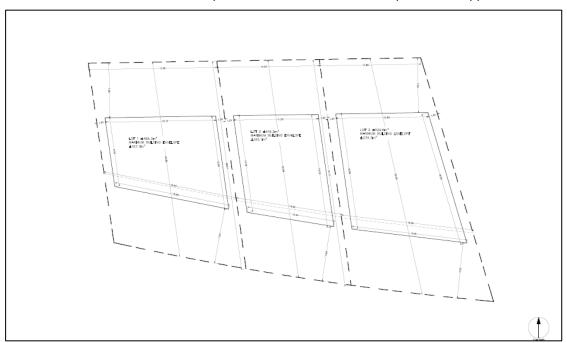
Proposed Concept Plan, prepared by IBI Group
